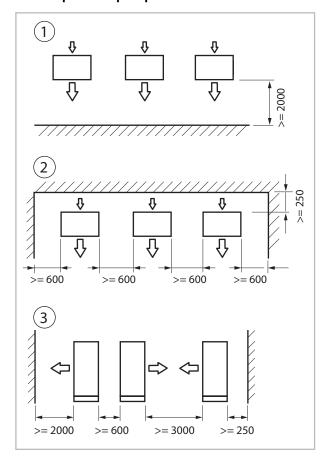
Minimum distances during construction of multiple heat pumps in mm
